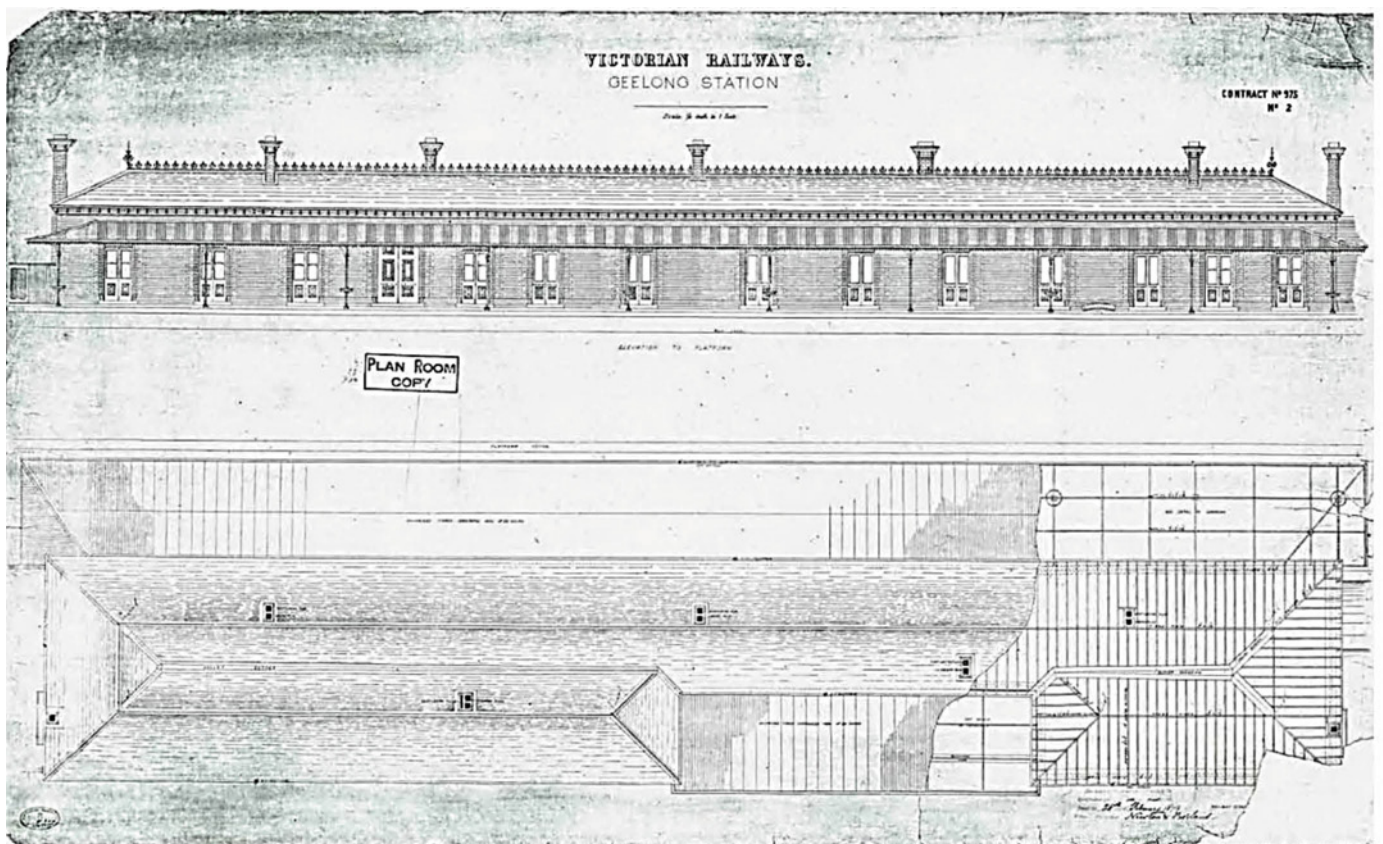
G.W. Simms, Victorian Railways Geelong Station, 'Elevation to Platform & Roof Plan', 1879. Source: GRS 3132, Geelong Heritage Centre collection.
